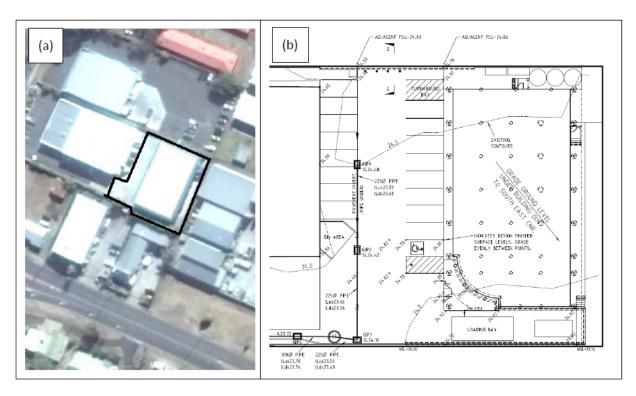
Study site: (a) aerial view; (b) drainage network plan
